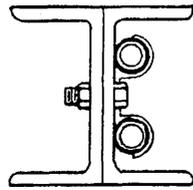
Method of Bolting Uprights Together Where Power Feeders Are Mounted.
